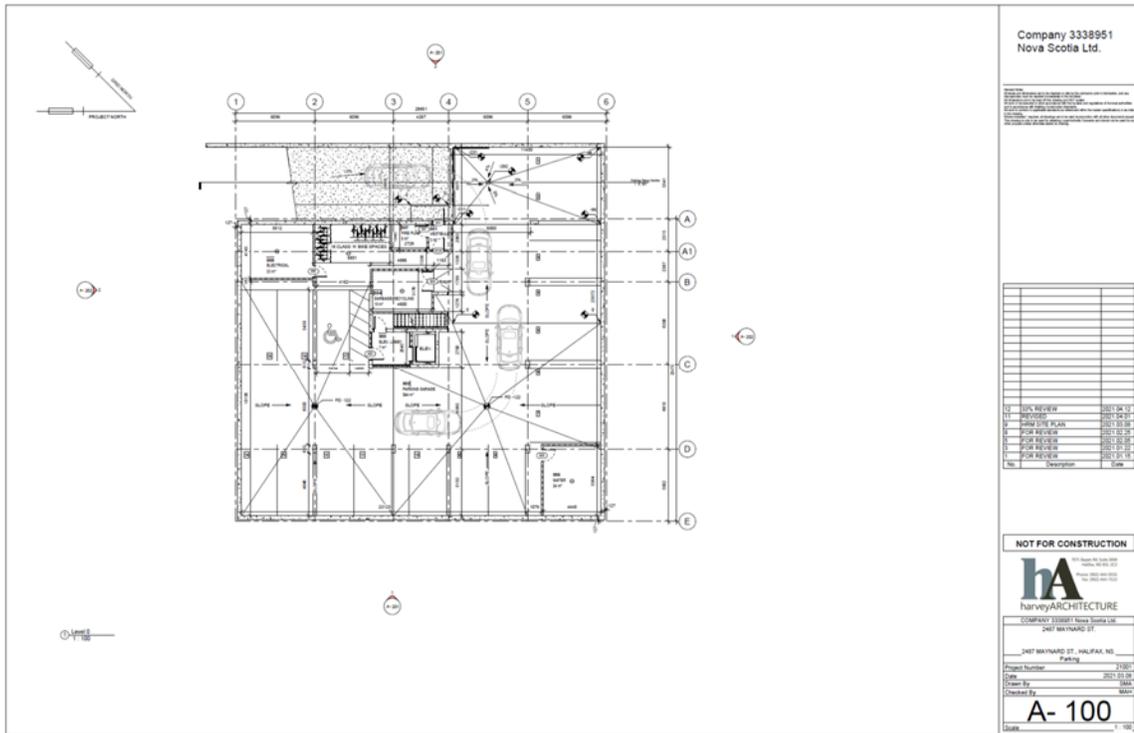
2487 Maynard Street Proposed Level 1
